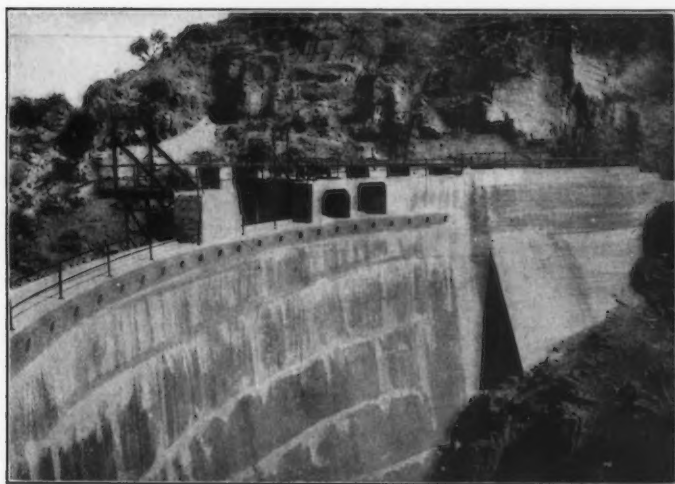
UPPER PORTION OF DAM, REAR FACE. GRAVITY SECTION ABUTMENT AT EAST END.
